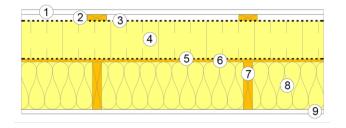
Wall section detail of the Jackson Residence in plan view (exterior insulation).
